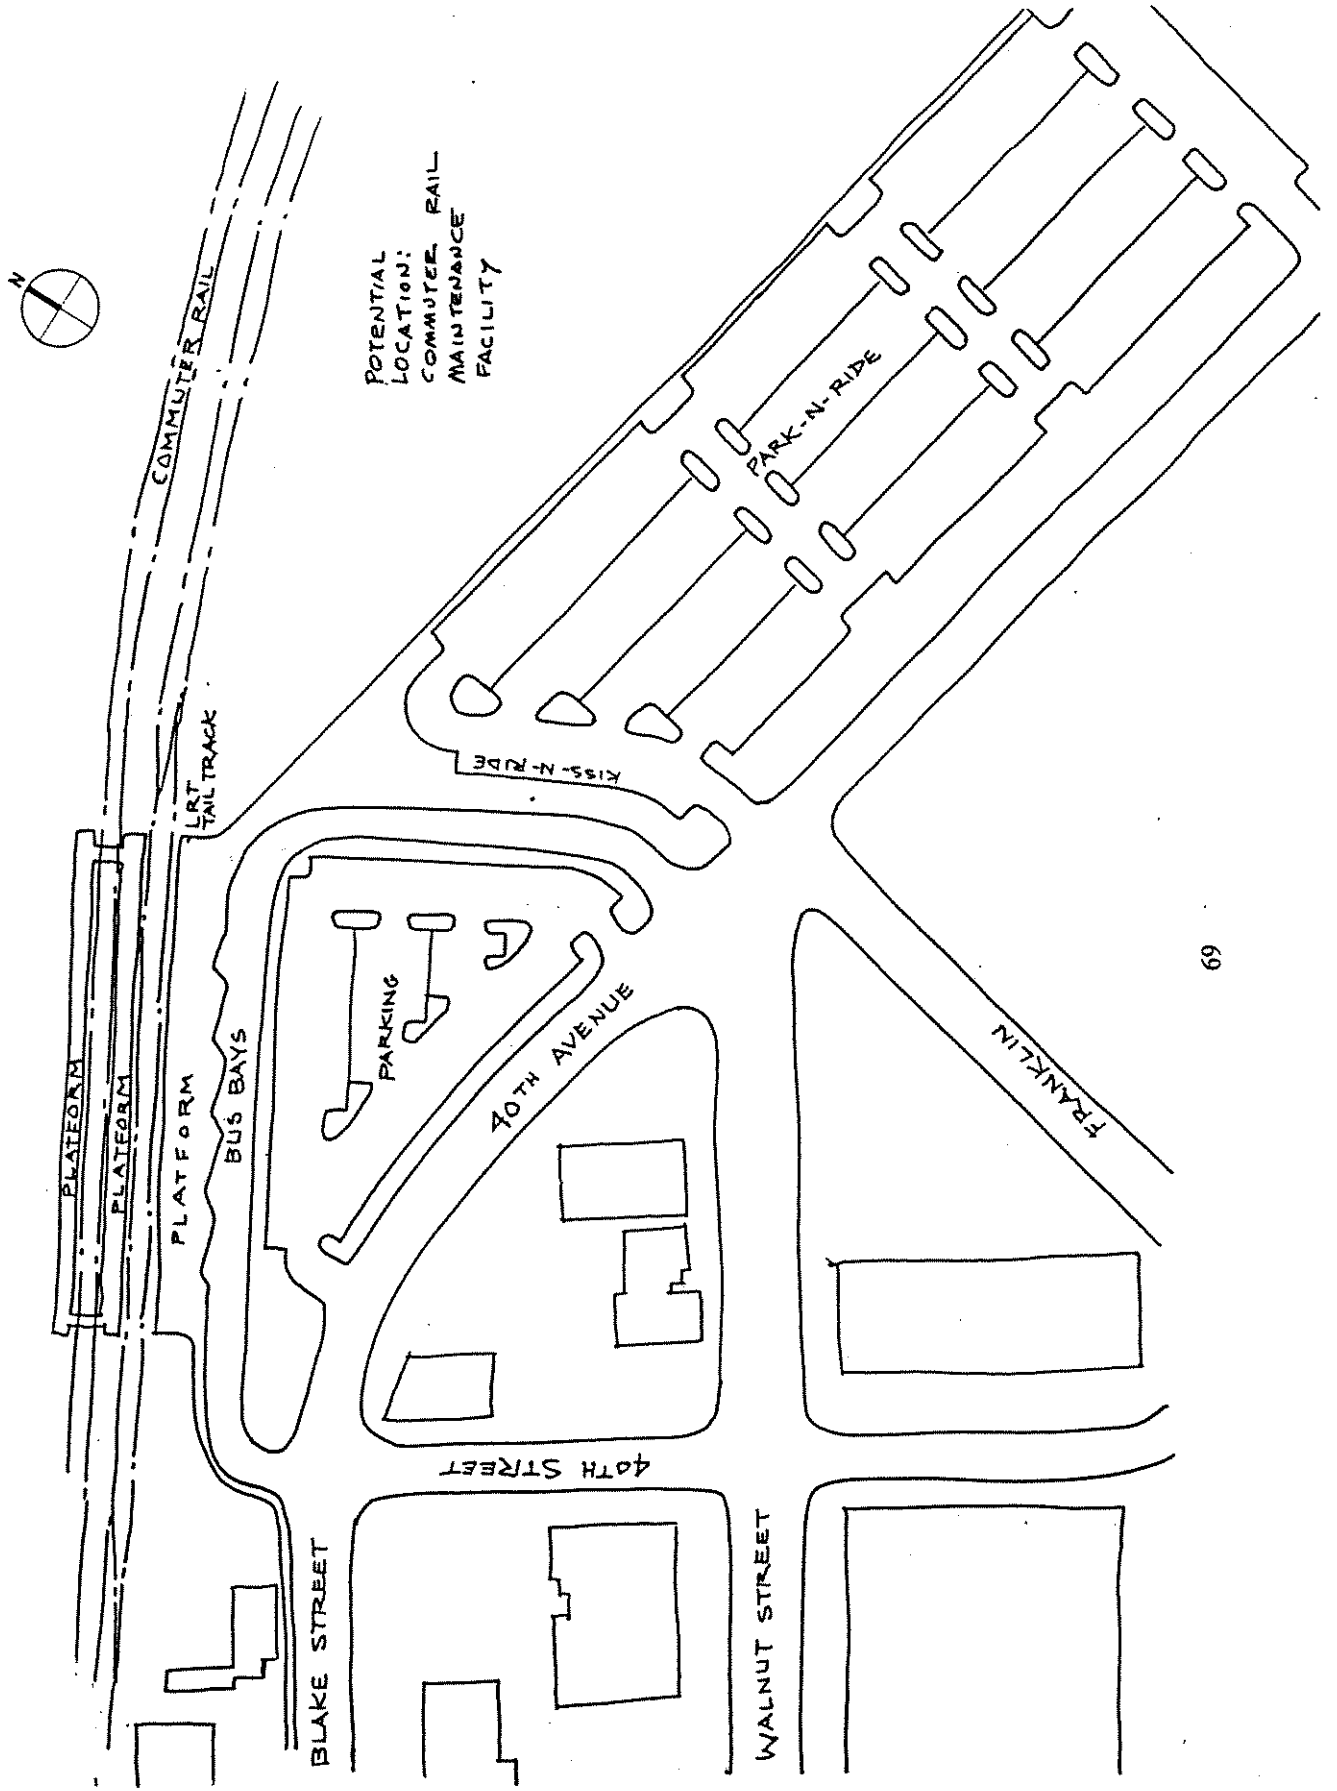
Stapleton Commuter Rail Station Conceptual Plan
